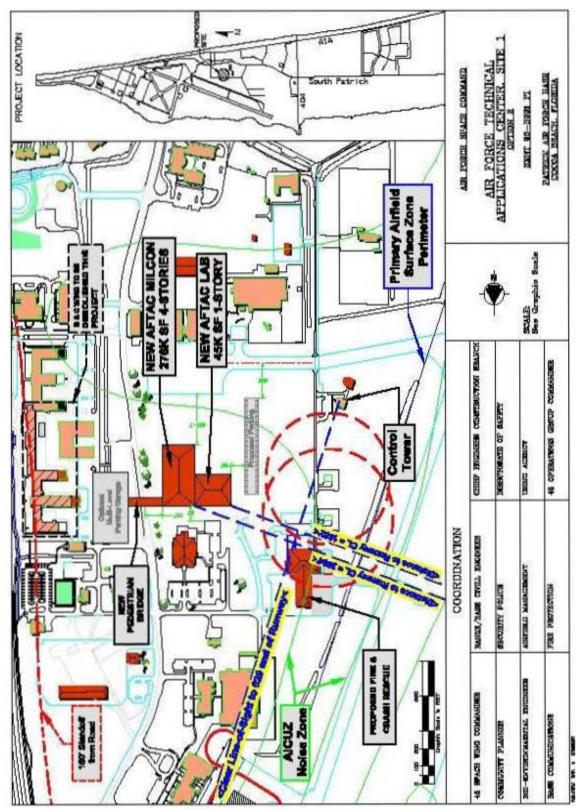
FORMER PROPOSED AFTAC FACILITY SITE PLAN
